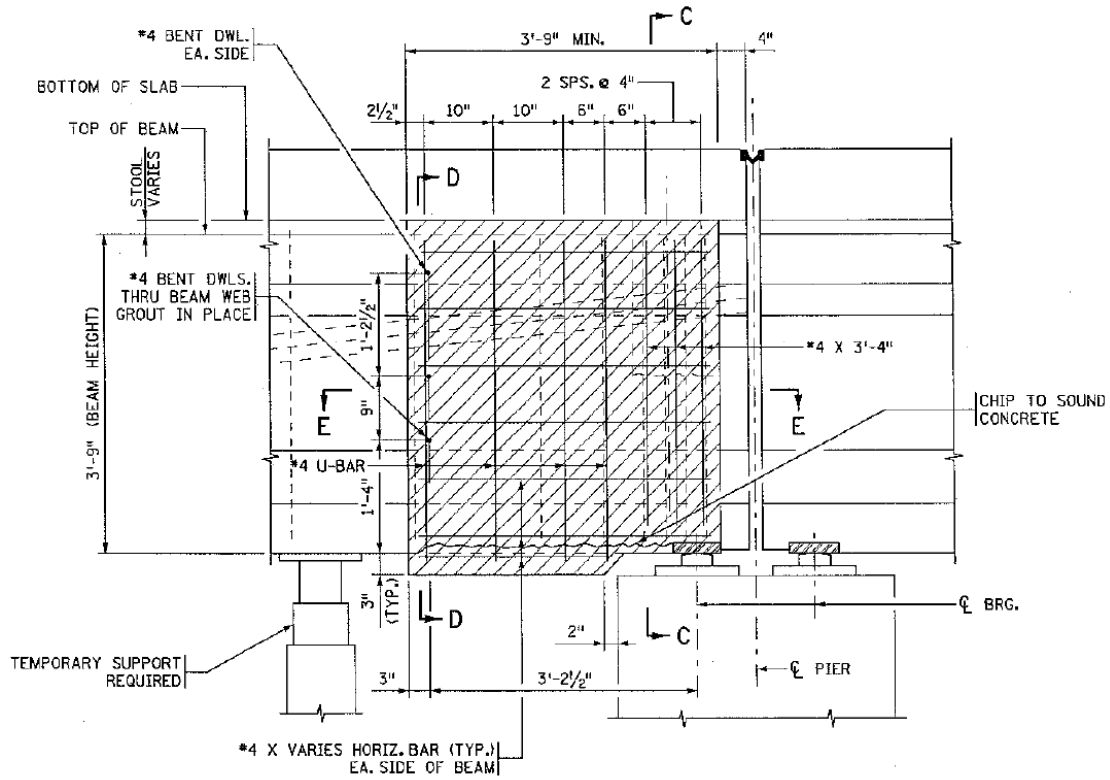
shows the detail in elevation and Figure 1.2 shows the detail in section for the MnDOT designed repair that was applied to the girders that were tested as a part of this report. The repair consisted of the following four steps:
